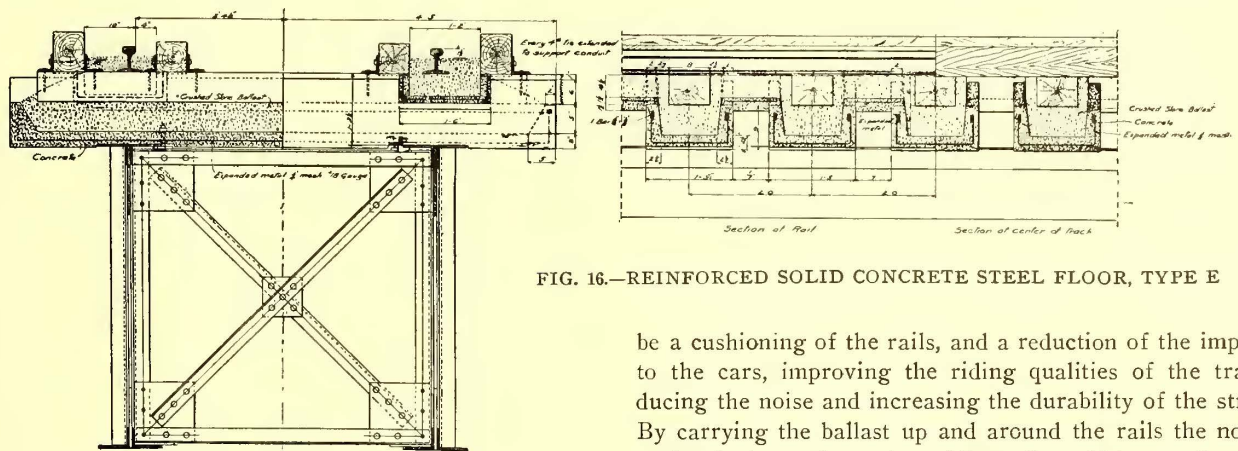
REINFORCED SOLID CONCRETE STEEL FLOOR, TYPE E
